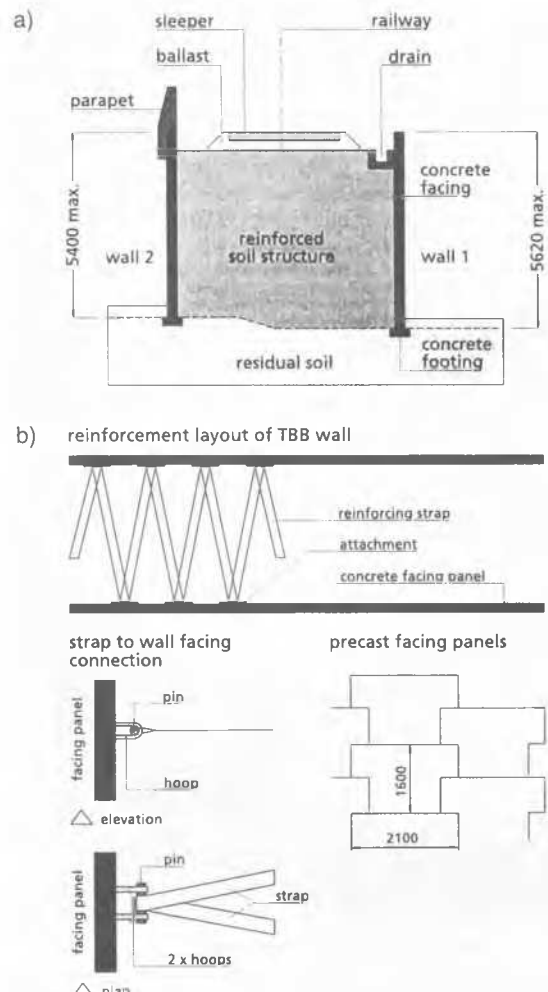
a) Cross-section of the railway embankment; b) arrangement of straps, connection of strap to concrete element (according to Lo, Li, Gopalan & Gao)
